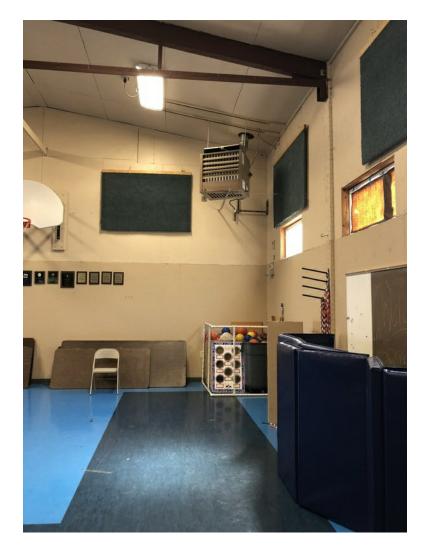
Suspended Mechanical Equipment on East Exterior Wall (looking east)
